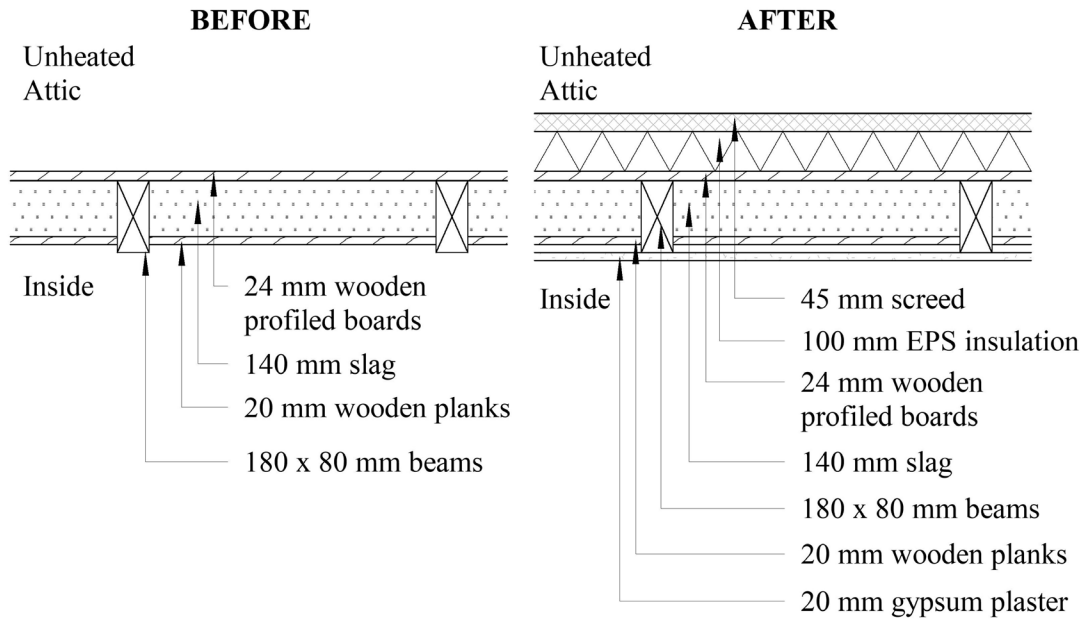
Cross-section view, roof construction, initial and retrofitted state.
